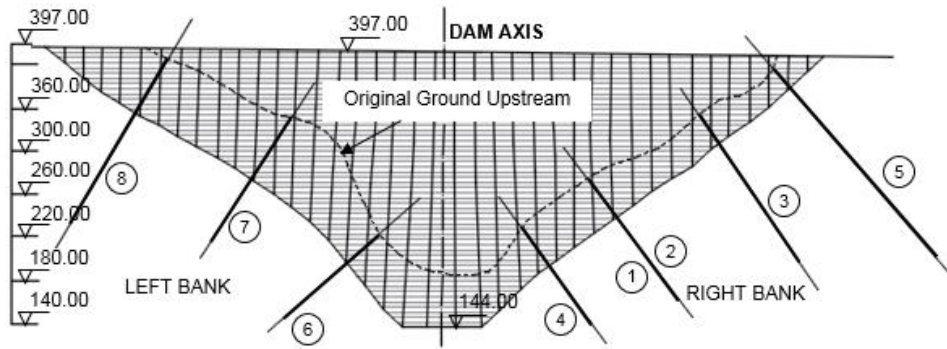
Final foundation elevations together with natural ground levels for Deriner Arch Dam. (Deriner Dam Application Design Drawings, various dates)
